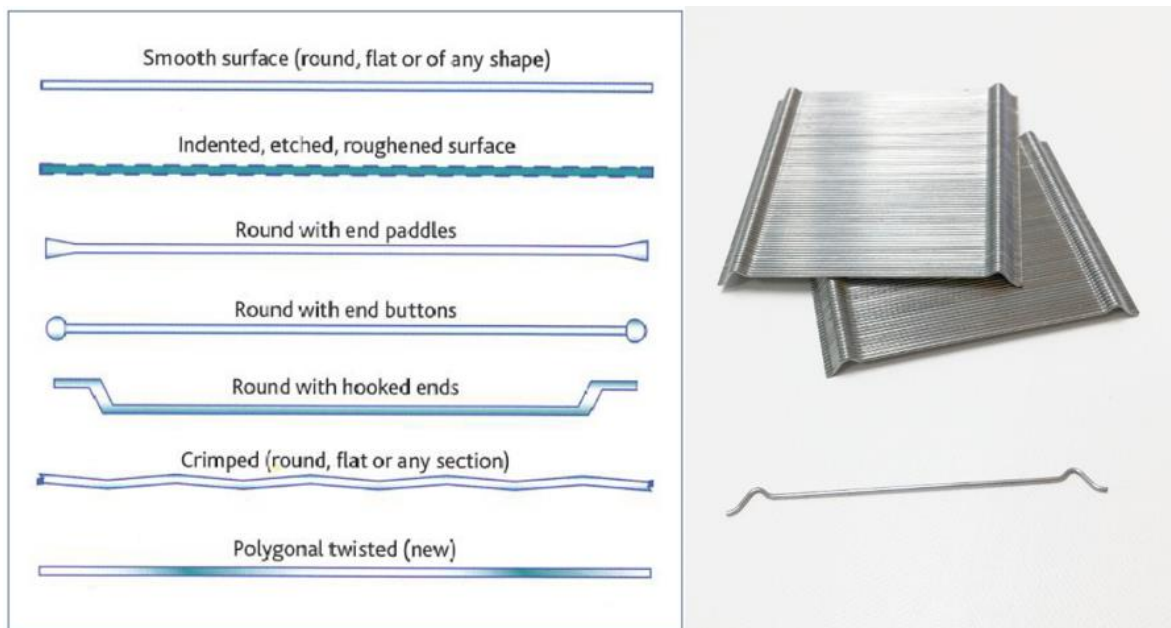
Left: common types of steel fibres. [19] Right: new steel fibre type (photo by author).
